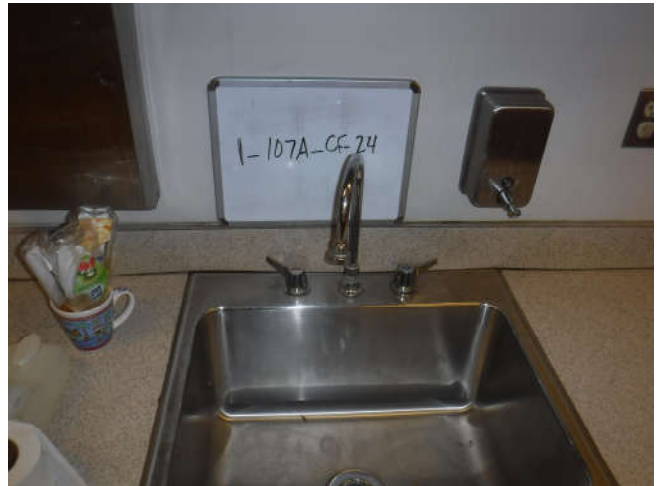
Classroom faucet, on the right next to restrooms (Kindergarten)
